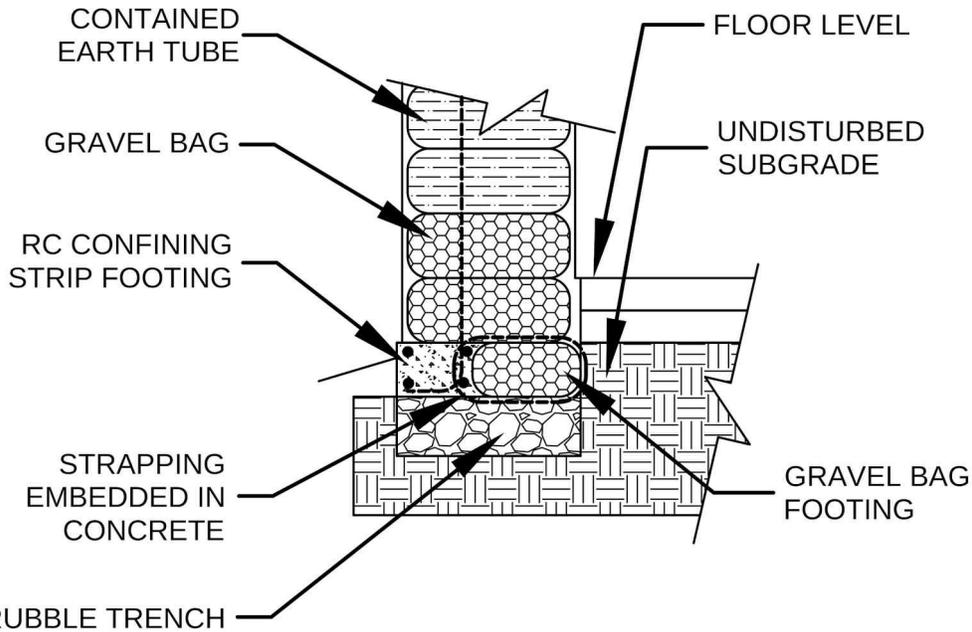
Confining strip footing holds gravel bags in place with modest concrete use.
